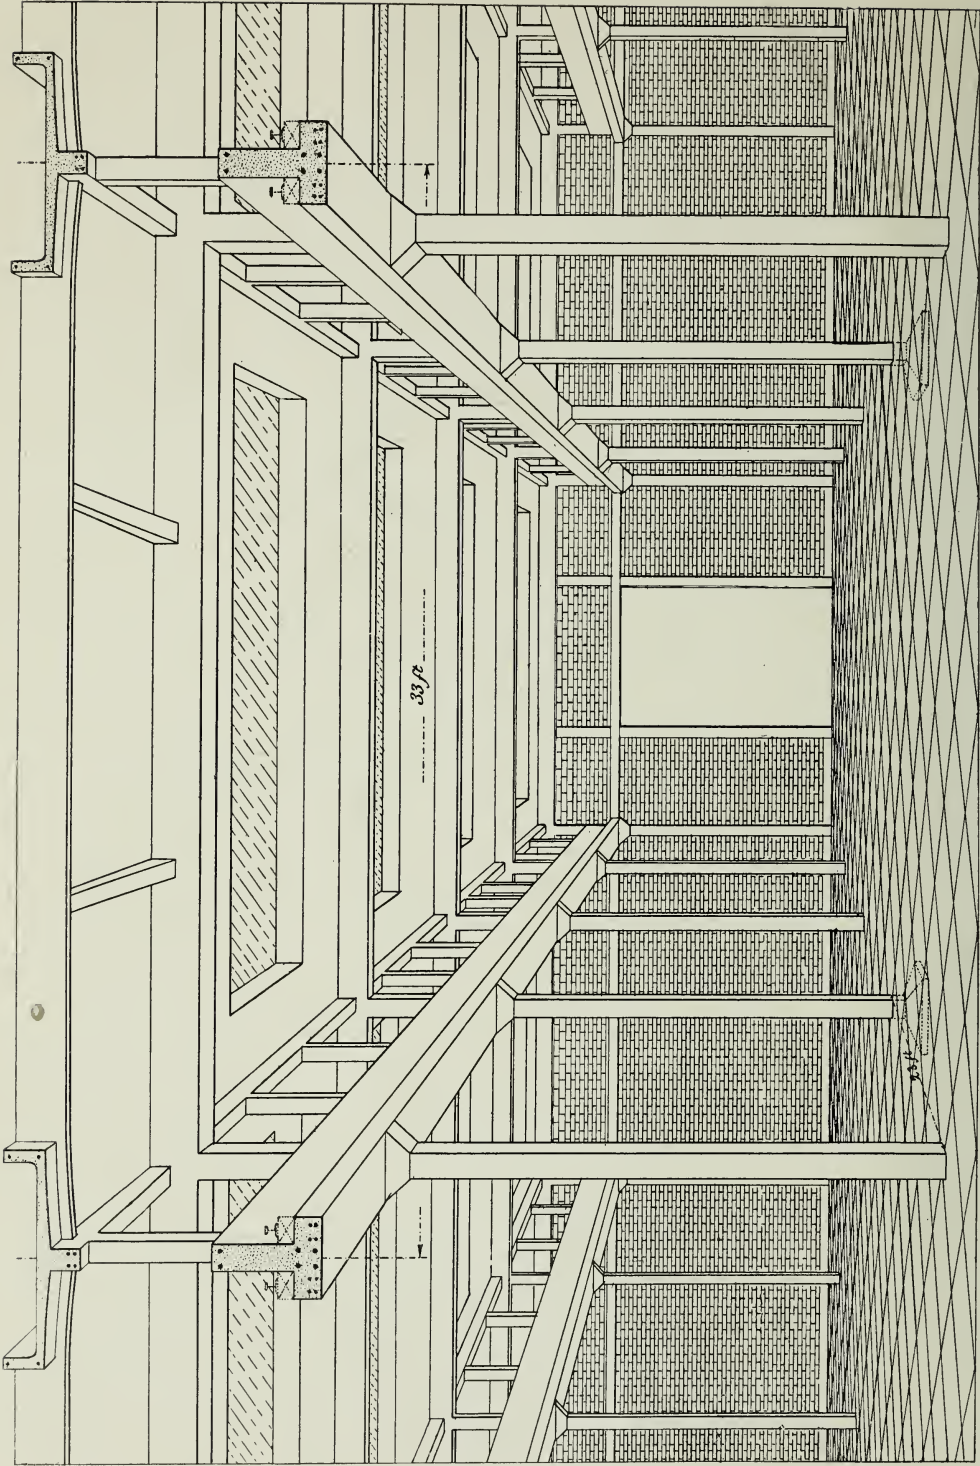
Factory Building at Epinal, France. Beams carrying a 30-ton traveling crane.
